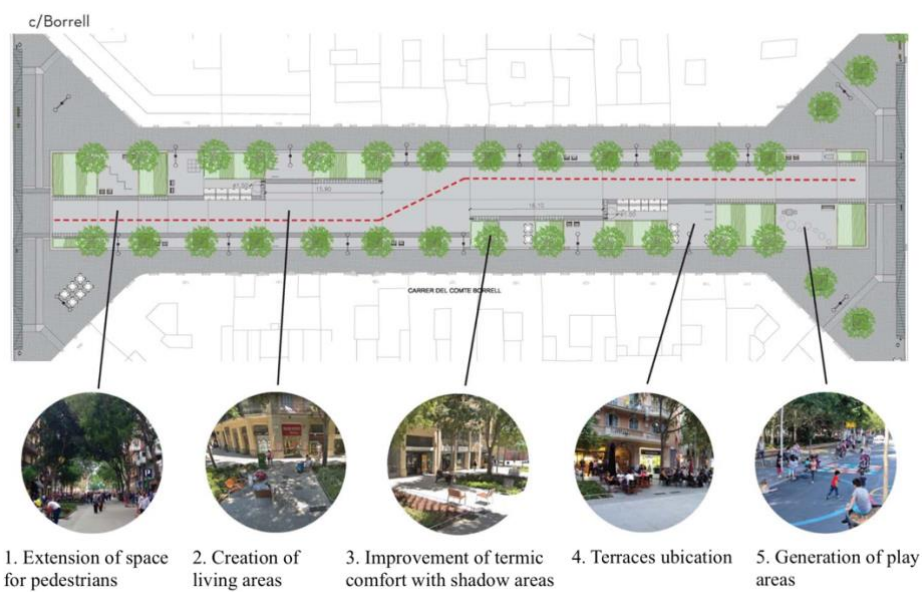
Pedestrian section of Borrell street (Ajuntament de Barcelona,2018)
